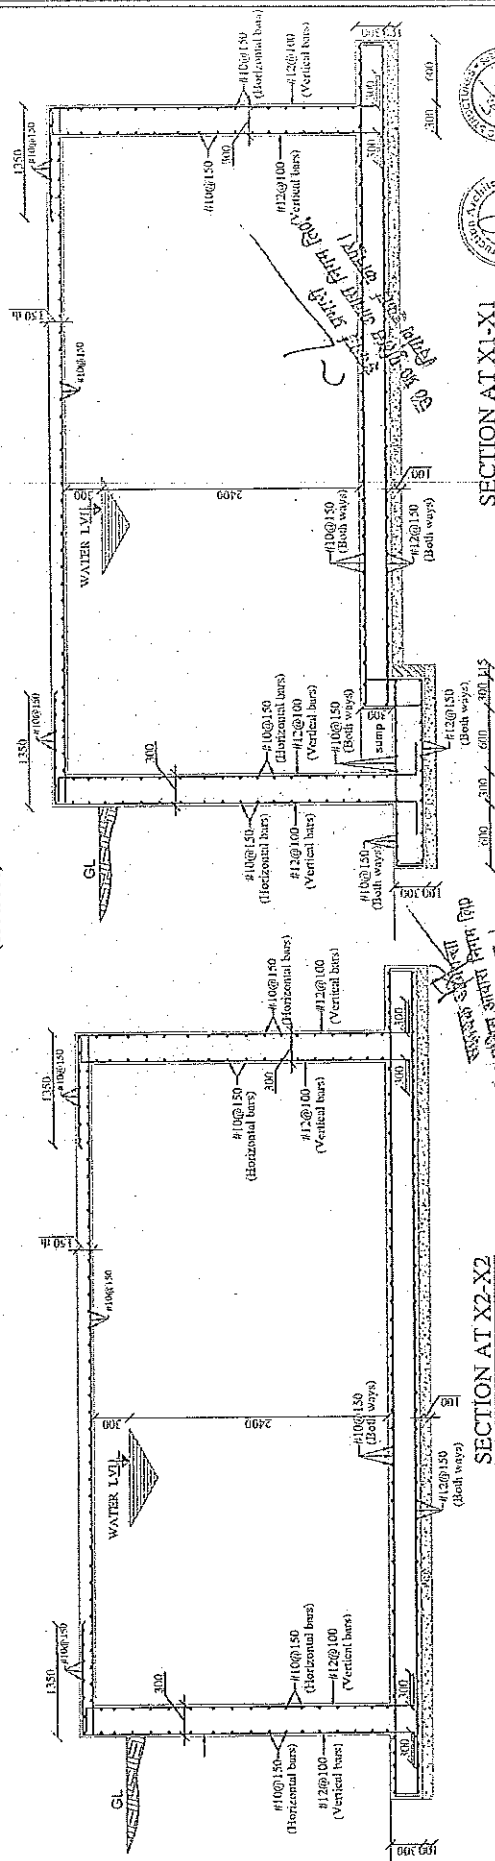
DETAIL OF TOP SLAB OF U.G. TANK & SLAB
